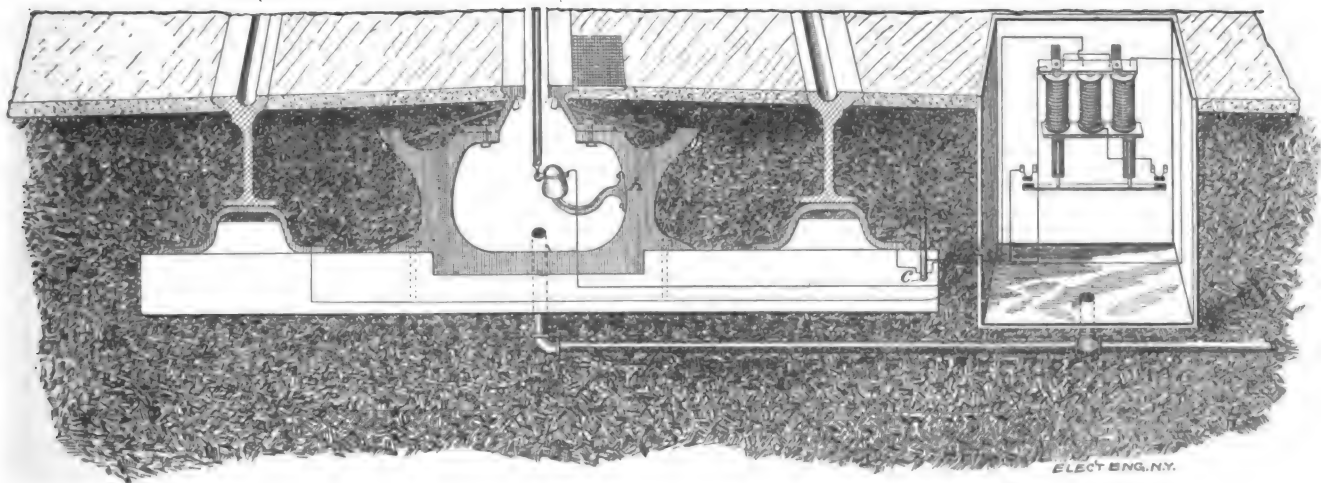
SECTIONAL VIEW OF CONDUIT, WHELESS SYSTEM.
